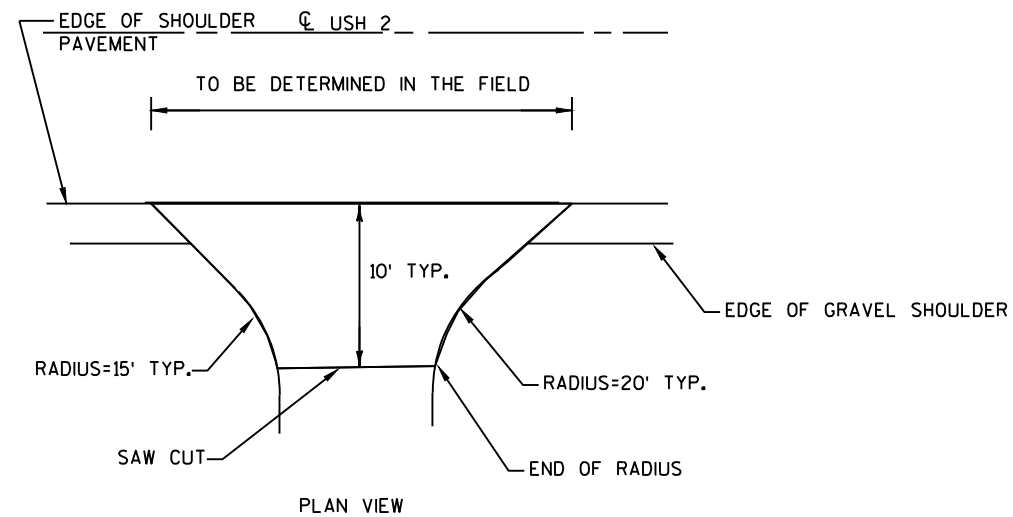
DETAIL FOR CURB & GUTTER REPLACEMENT AREAS
